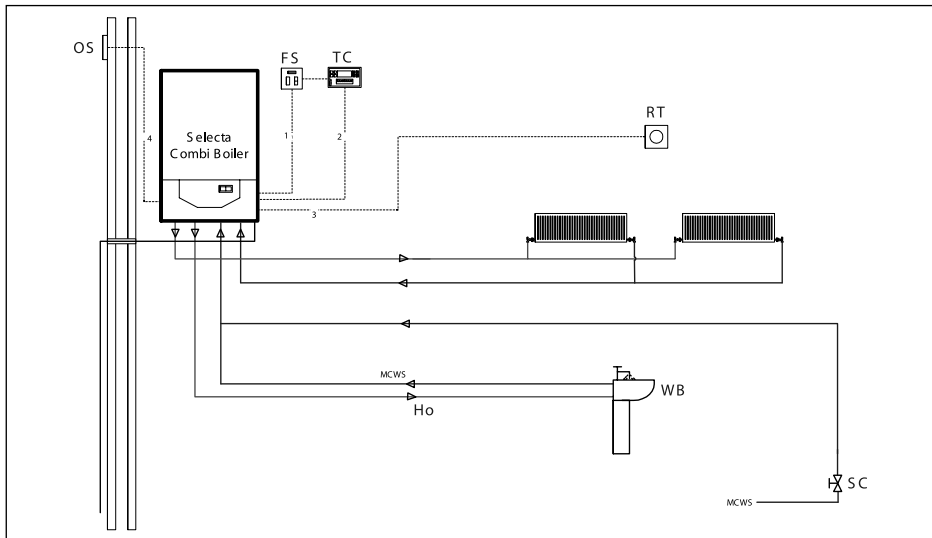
Hydraulic example Selecta combi boiler (use in conjunction with electrical drawing Fig. 17)
